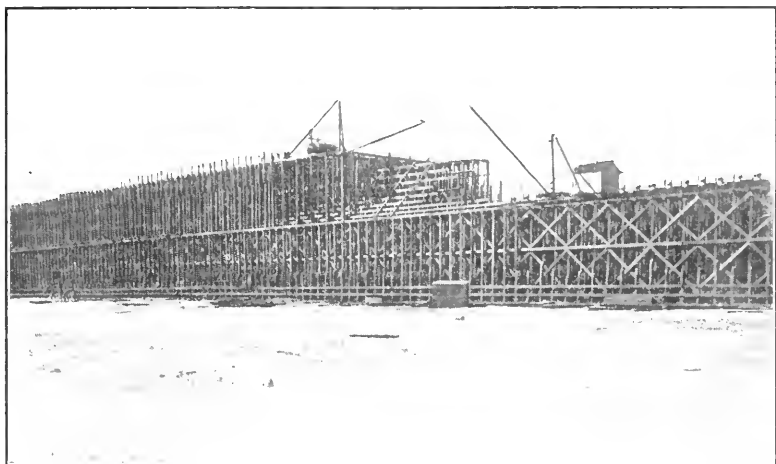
ORE DOCK NO. 3 OF THE GREAT NORTHERN RAILWAY, UNDER CONSTRUCTION.
